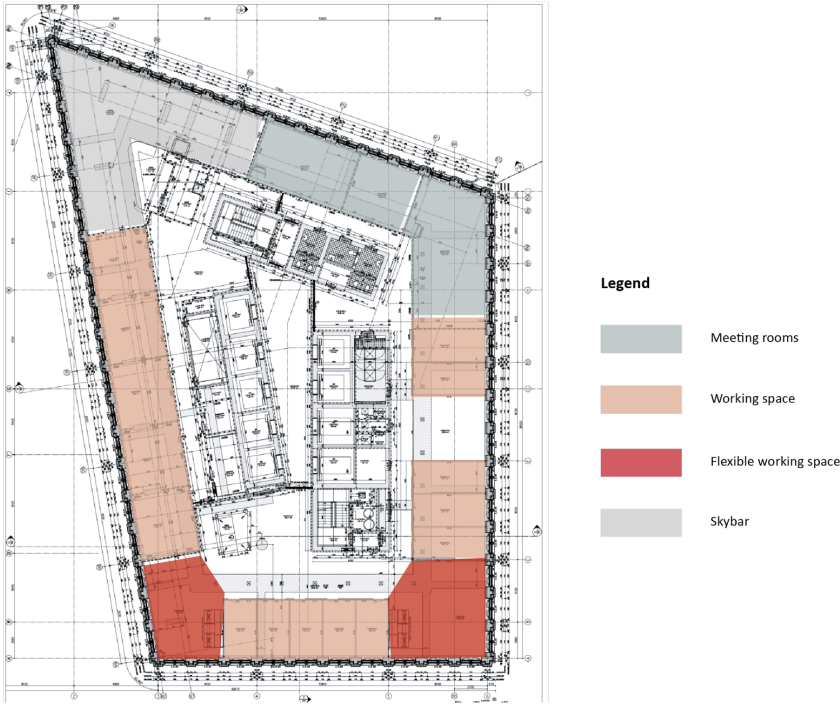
Floorplan 22nd floor JuBi towers and corresponding functions near the façade - north tower (BIM-model JuBi towers)
